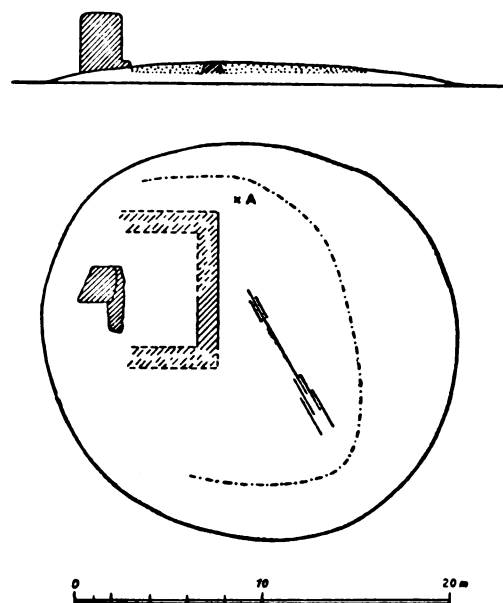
Plan and section of Watch-tower K 676 (Dor-tsaghan-tsonch).
